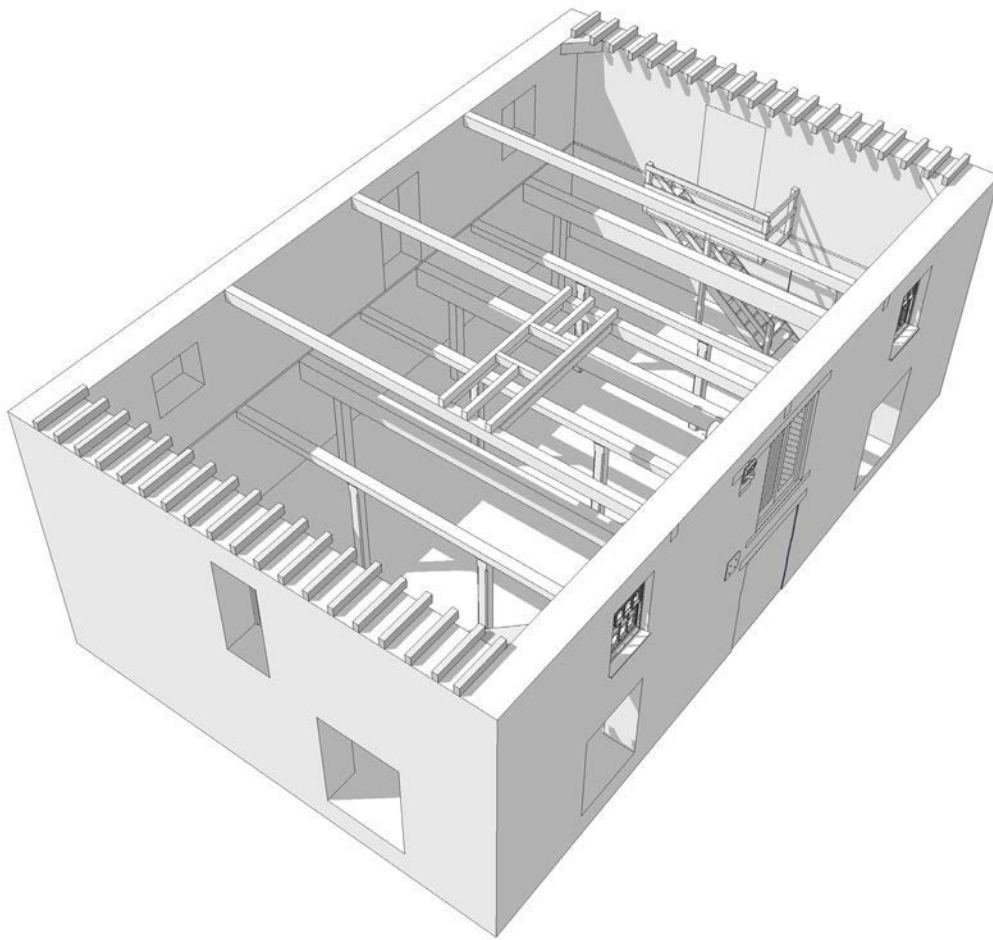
and 18. North warehouse, internal features, including attic beams and trap door access
